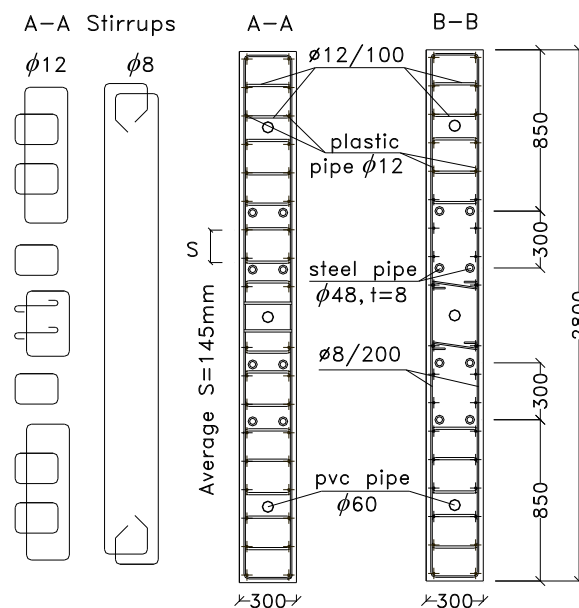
Details of the wall transverse reinforcement and position of the hollow dowels and tendons
